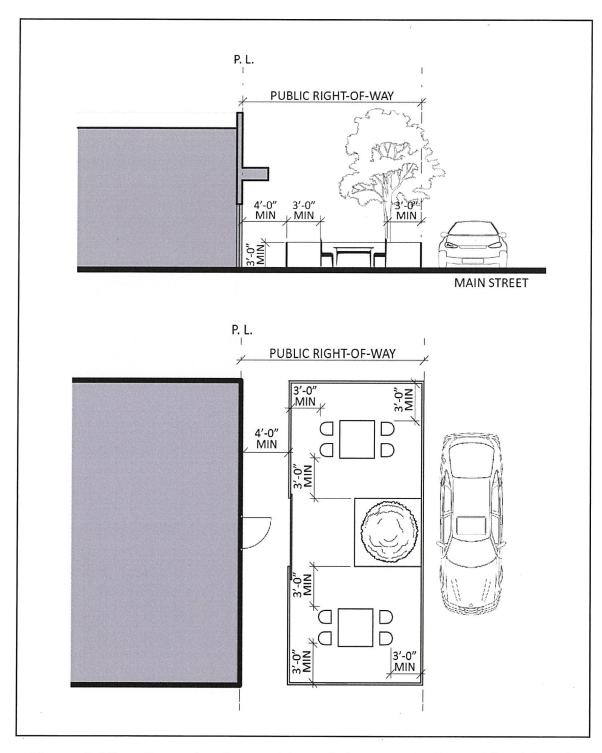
Example of an outdoor dining area in the public right-of-way with a barrier.
